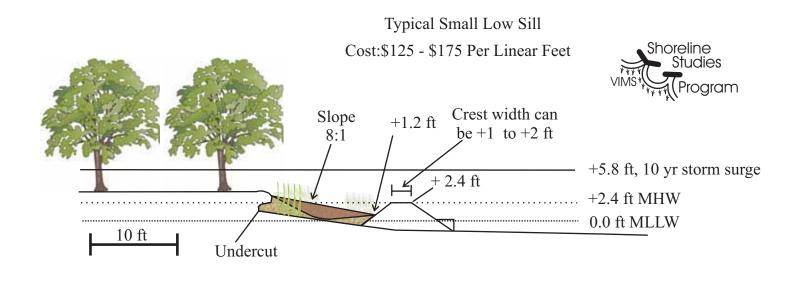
Typical cross-section of the small, low sill proposed at Site 118 in the Mathews County Shoreline Management Plan (Hardaway *et al.*, 2010).
